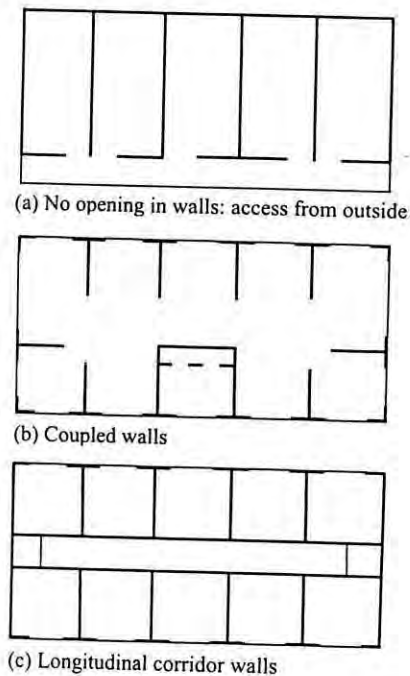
Schematic Layouts of Shear Wall Structures
